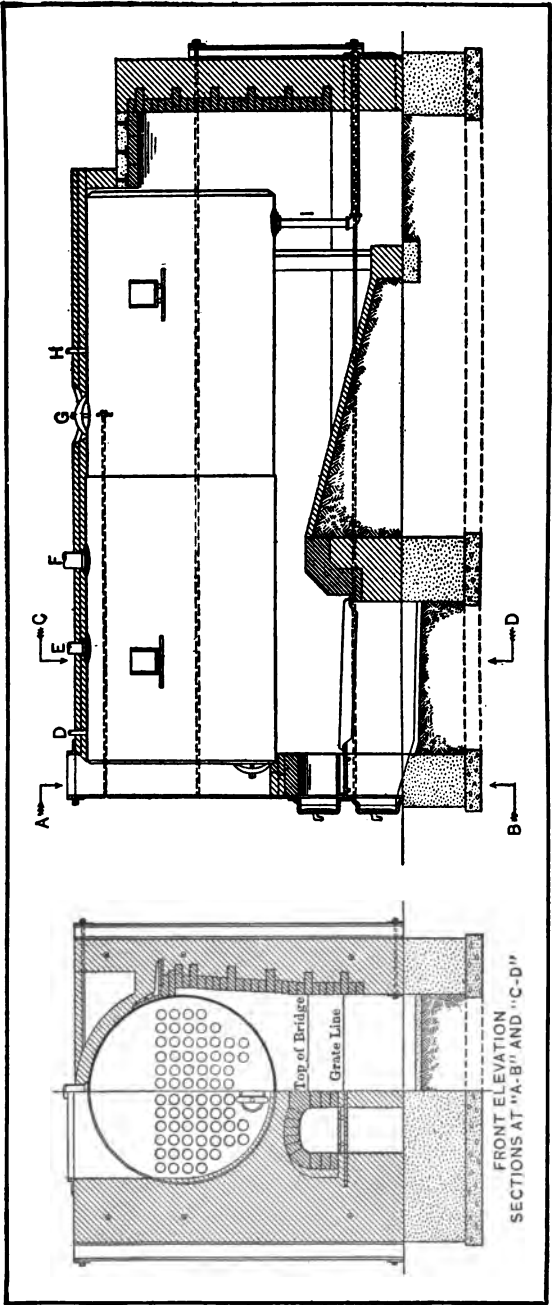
FRONT ELEVATION AND SECTION THROUGH BRICK-SET HORIZONTAL RETURN TUBULAR BOILER
